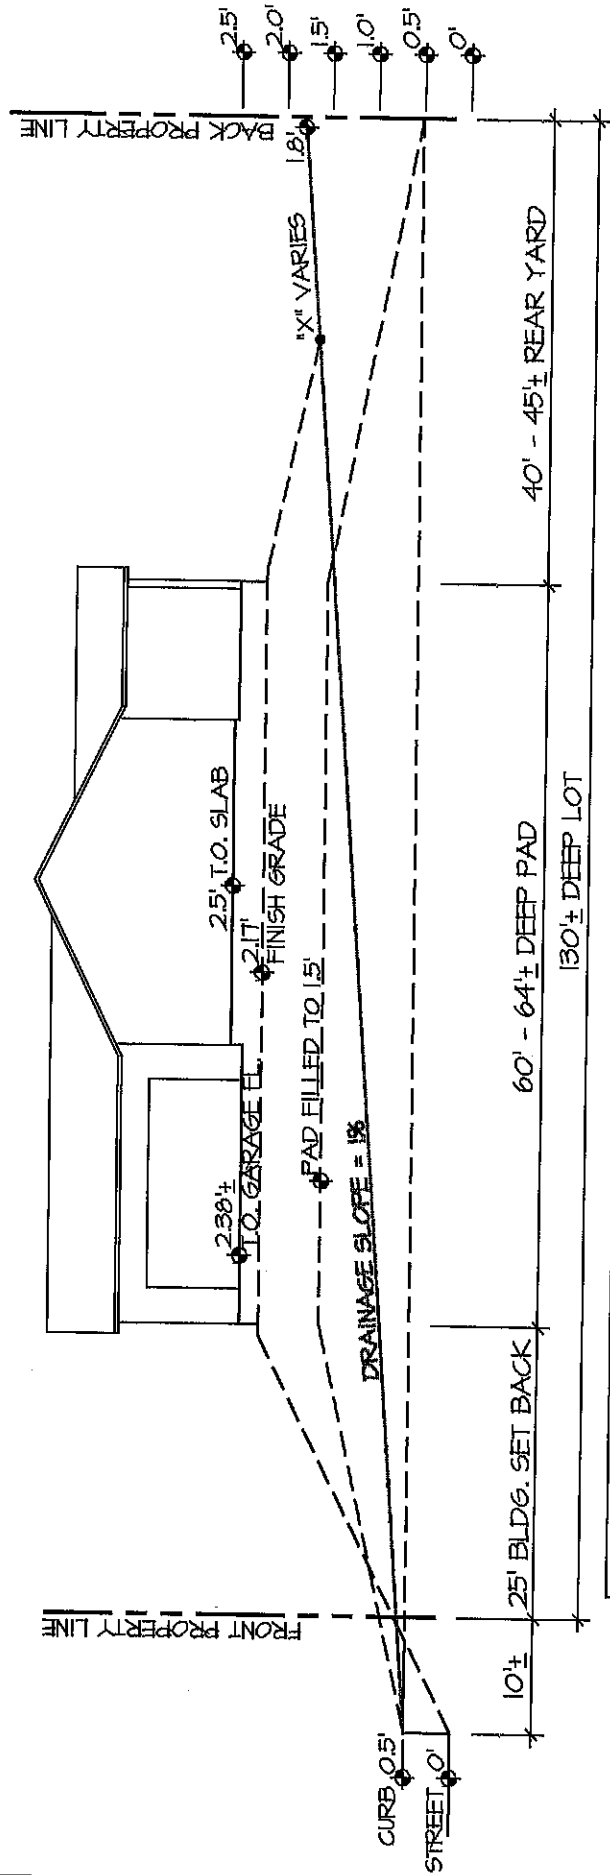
" GRADE ELEVATIONS @ LOT SECTION
